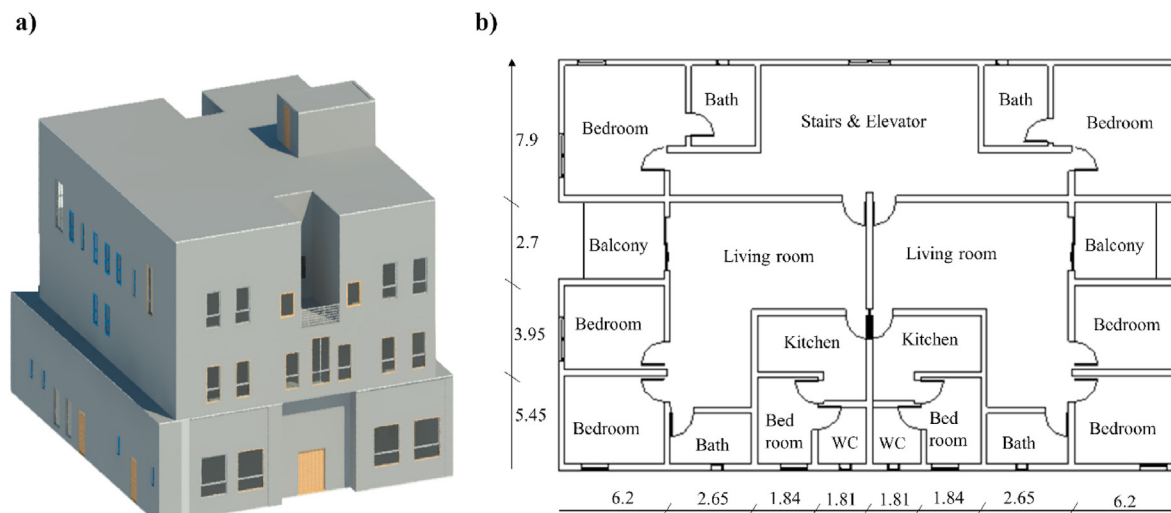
Illustration of a) the residential house under study and b) the plan section of the second floor.
